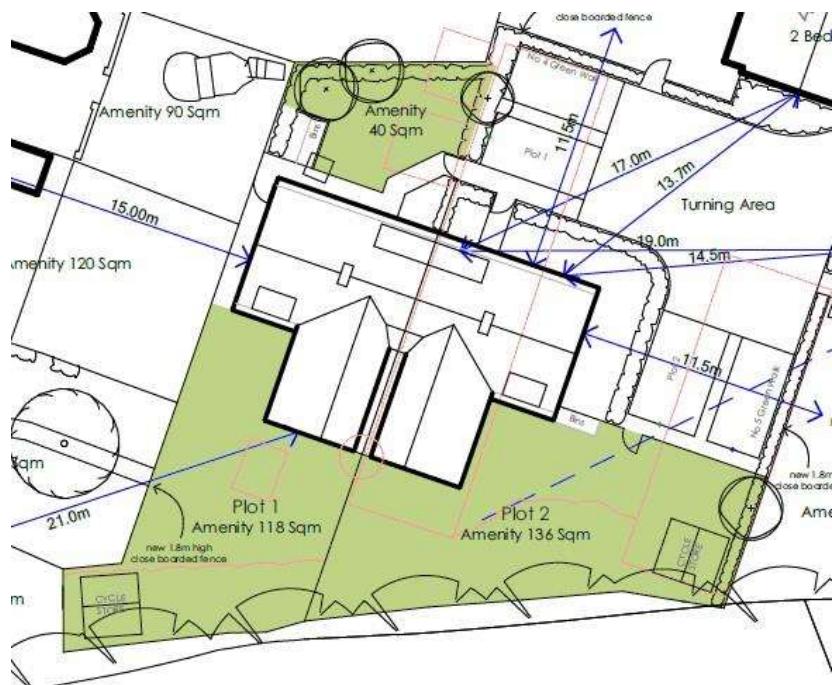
Proposed Development Showing Plots 1 and 2 Overlying Existing Site Layout
